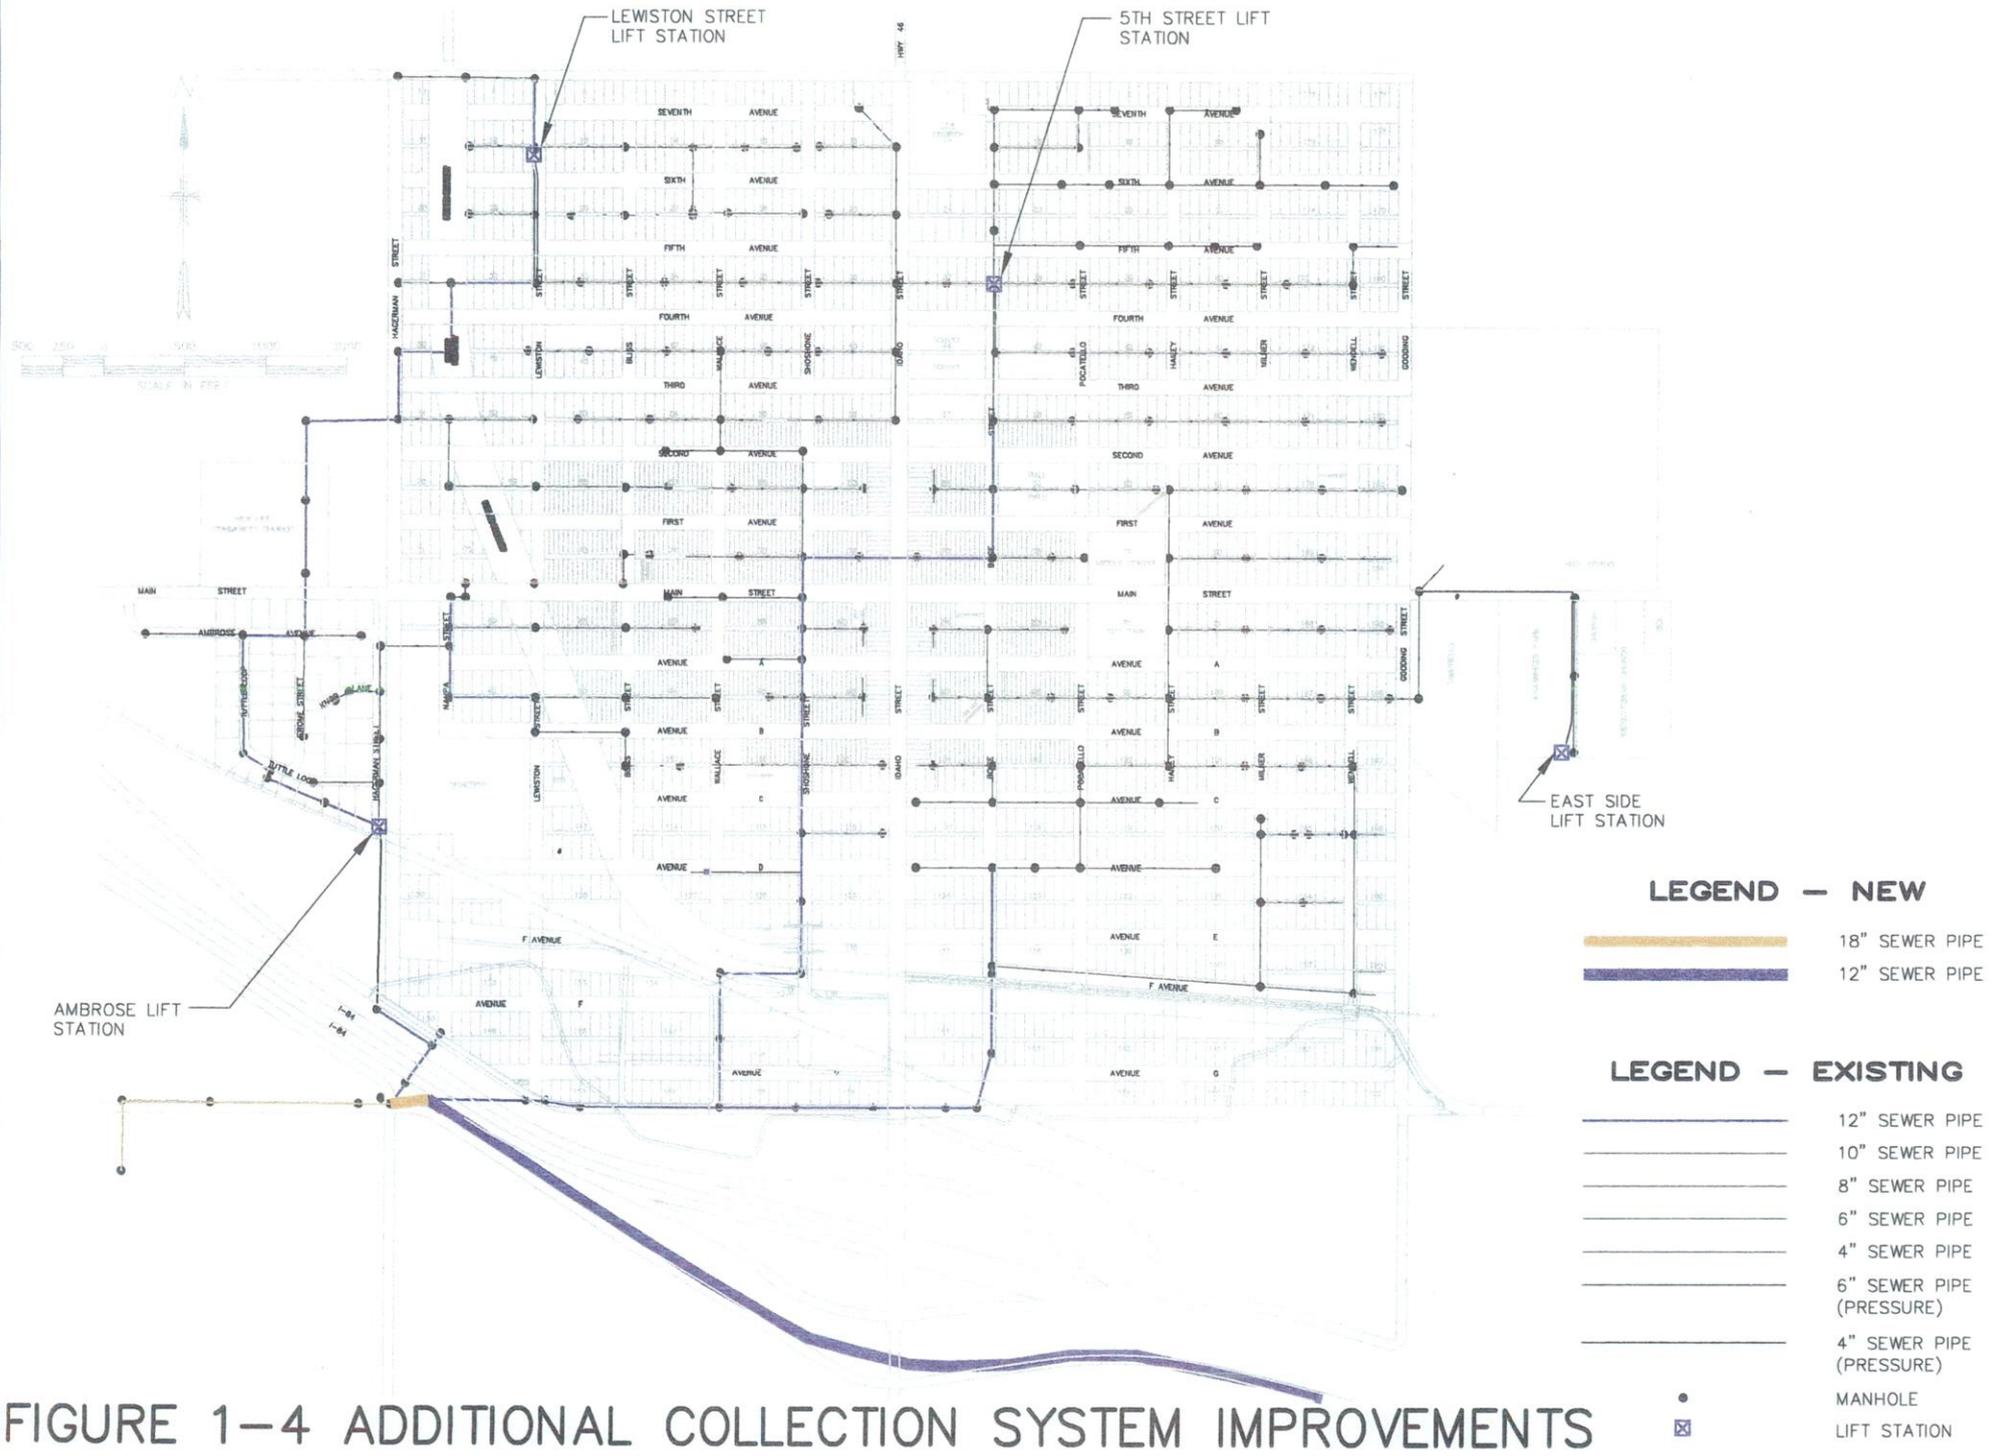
ADDITIONAL COLLECTION SYSTEM IMPROVEMENTS
